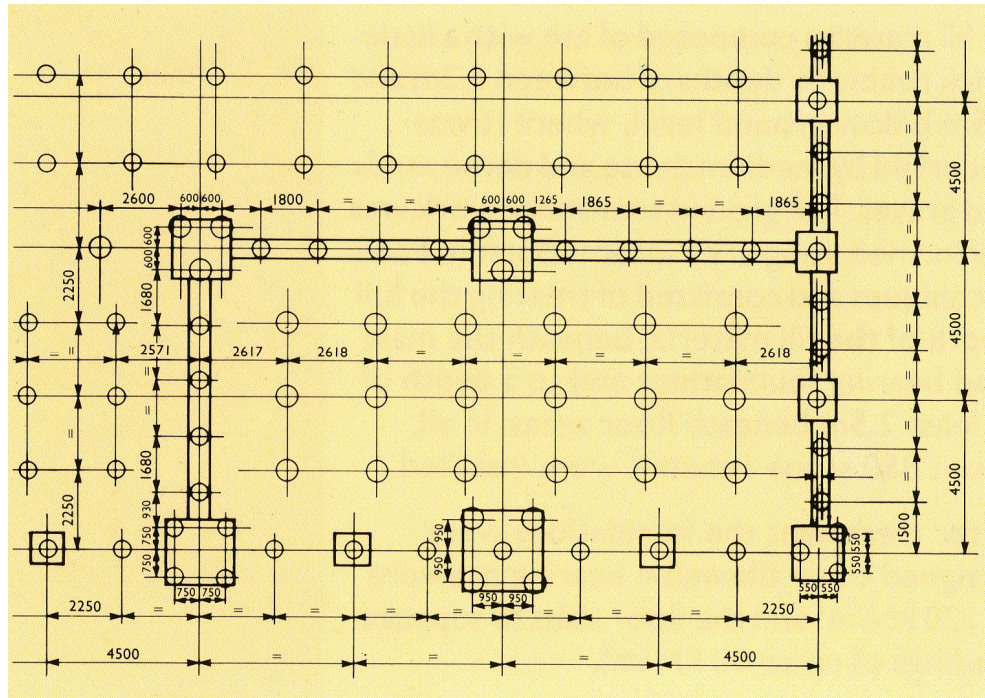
Stone column layout beneath strip footings for two-storey house (dimensions in mm), from Keller Brochure (2008).
